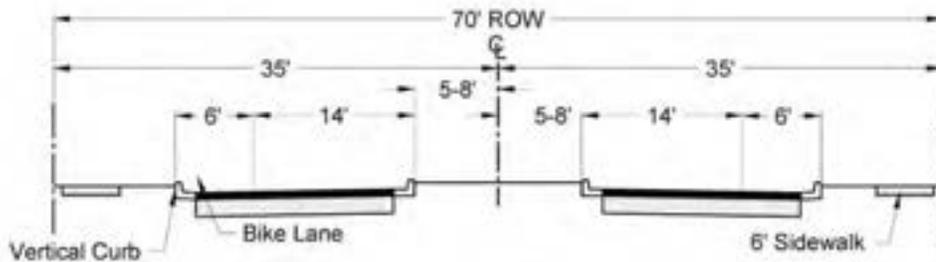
MAJOR COLLECTOR TYPICAL CROSS SECTIONS
